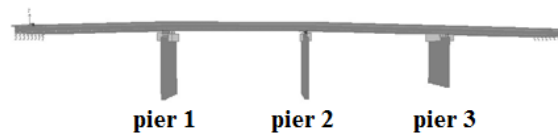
Side elevation of the bridge model, emphasizing the height of the columns.
